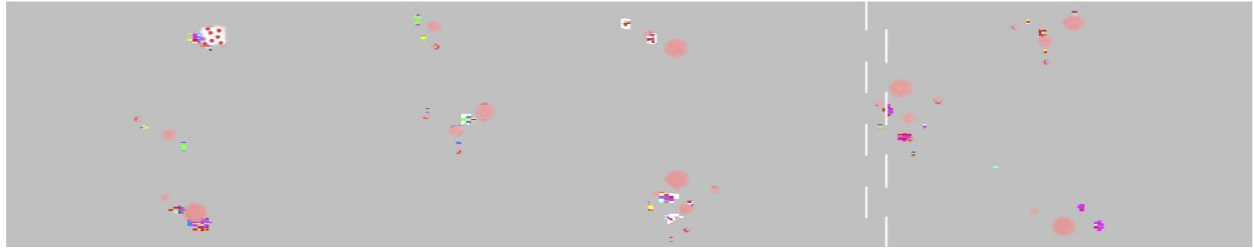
Overlay of PAUT and SRPN 02926 Drawing
